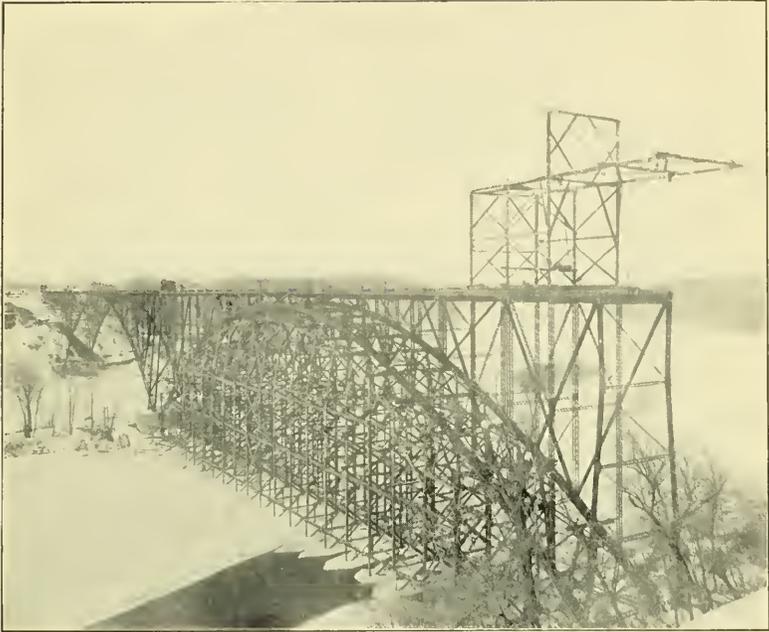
THE ERECTION OF THE LAKE STREET BRIDGE, OVER THE MISSISSIPPI RIVER,
